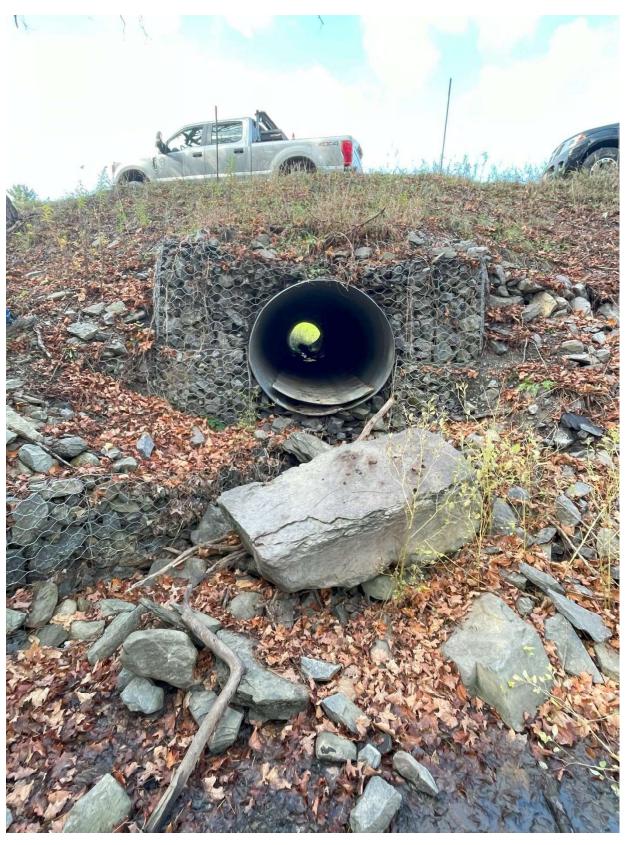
Garrett Road culvert looking west. Large vertical separation between the outlet invert and the streambed below.
